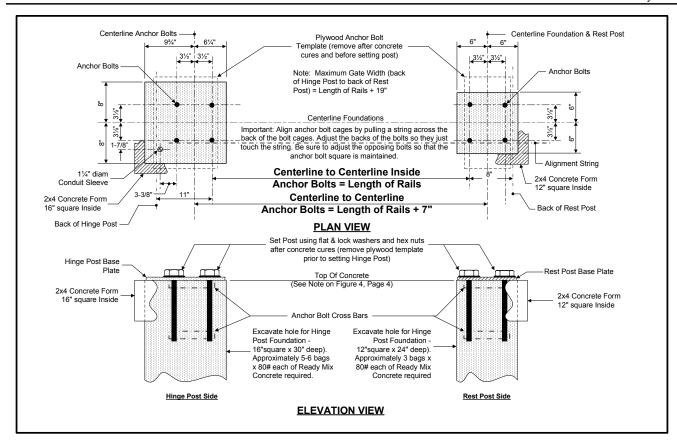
Single Gate Configuration Foundation Installation Details (Left hand installation shown, See Figure 4, page 4 to adapt for right hand installation)
